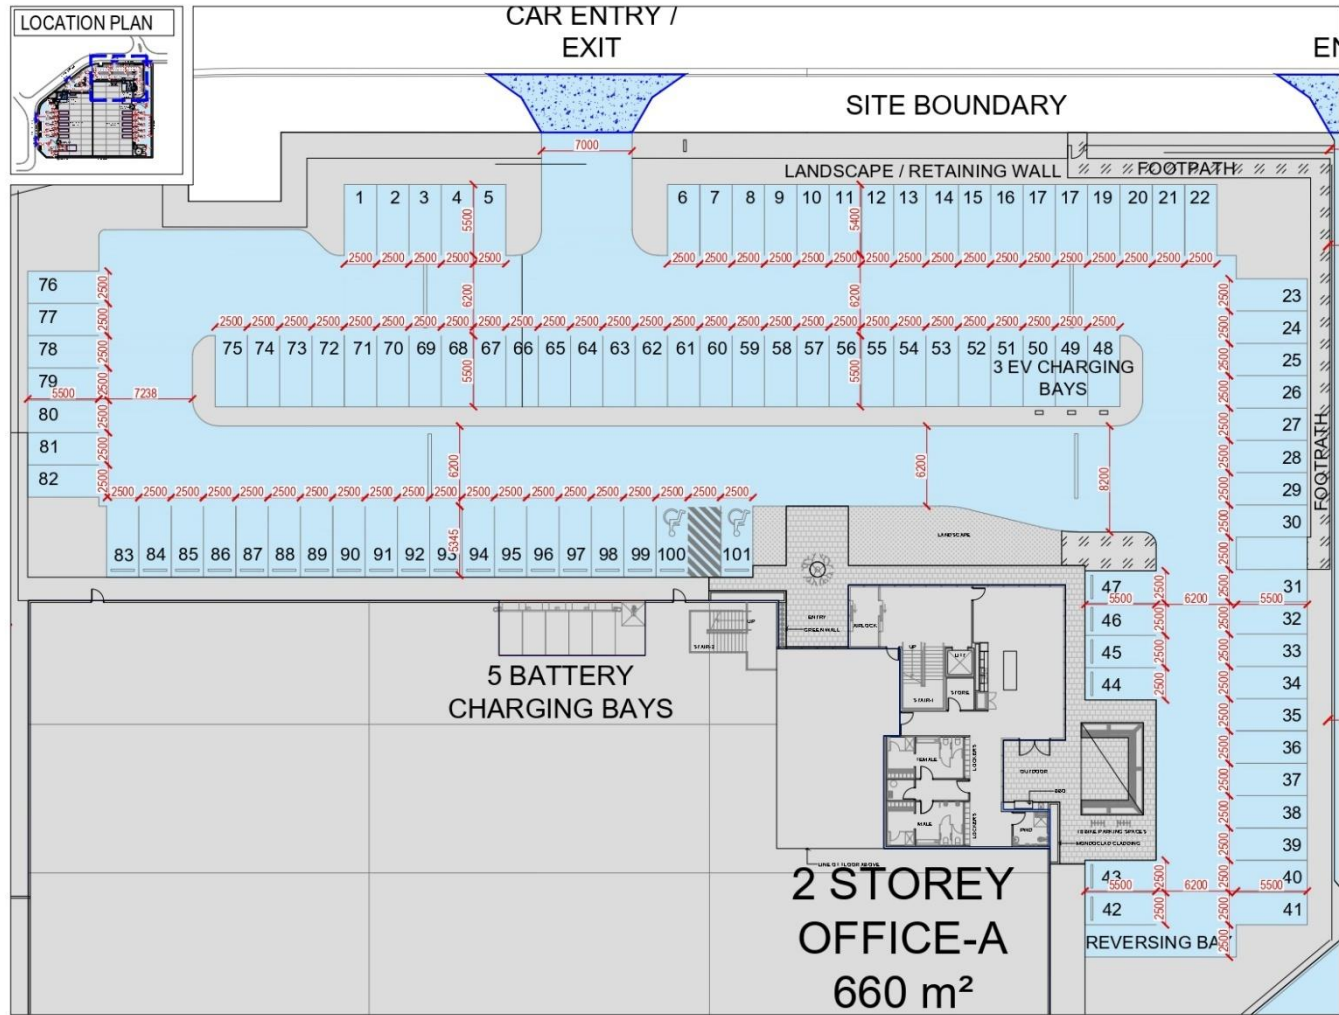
PROPOSED CAR PARKING DIMENSIONS
